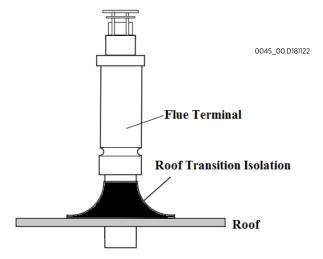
Waste gas vertical outlet flue set Roof insulation and flue transition part
